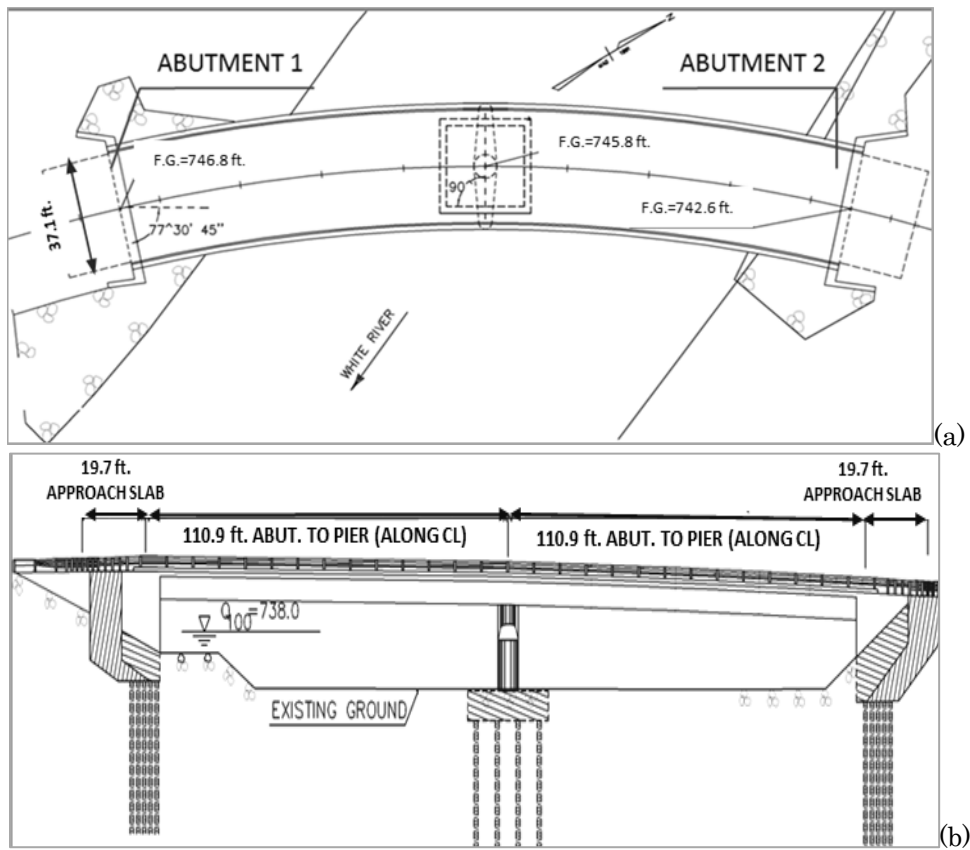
Stockbridge Bridge (a) plan view (b) elevation view
